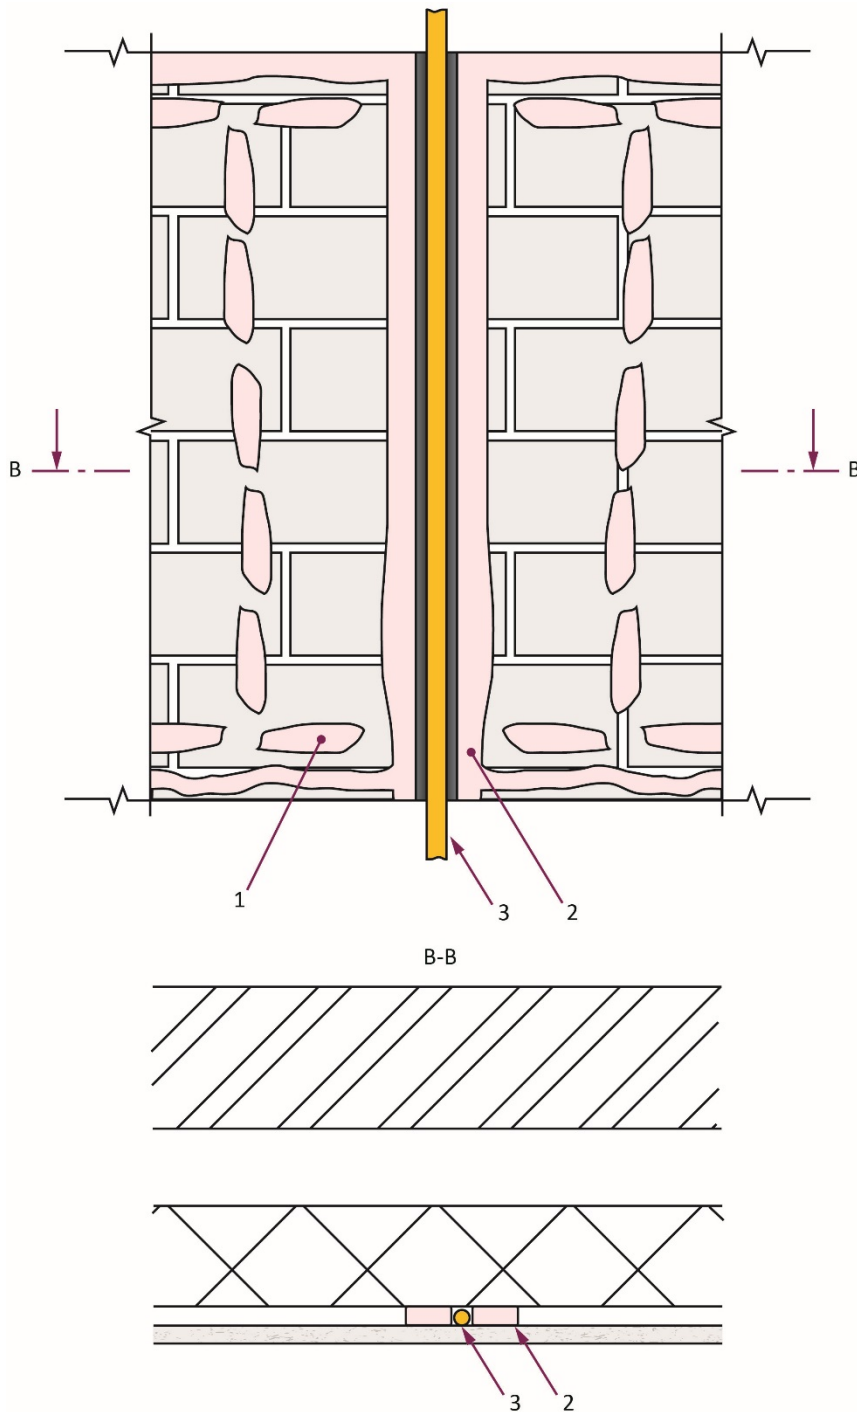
Typical example of TracPipe® installed in masonry construction wall (Brick and Block Plastered)
